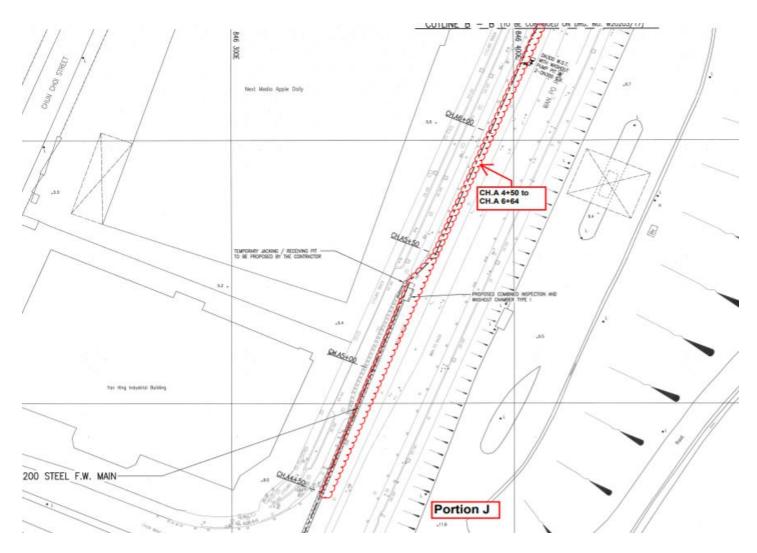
Location Plan for Portion J - CH.A 4+50 to CH.A 6+64
